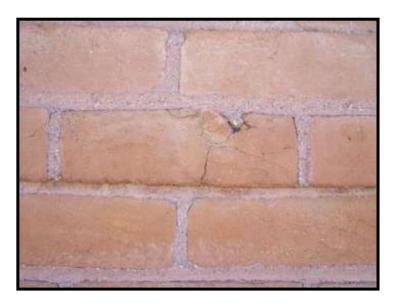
Brick with imperfections at north wall. Note vertical crack through the imperfection which is the weakest point.
